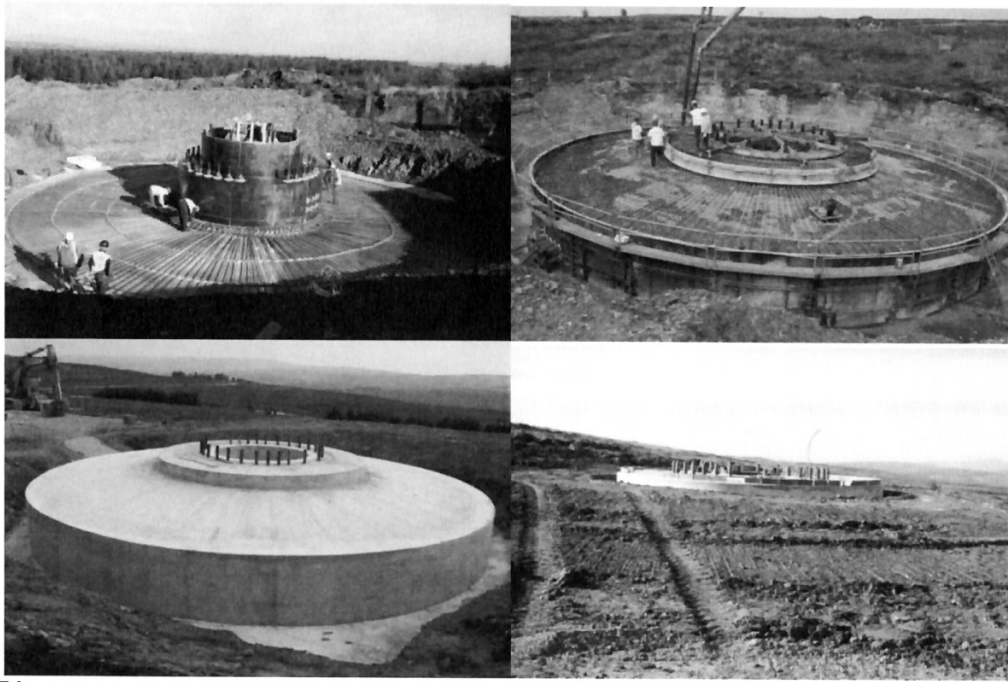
Concrete Pour Sequence for Turbine Foundation
